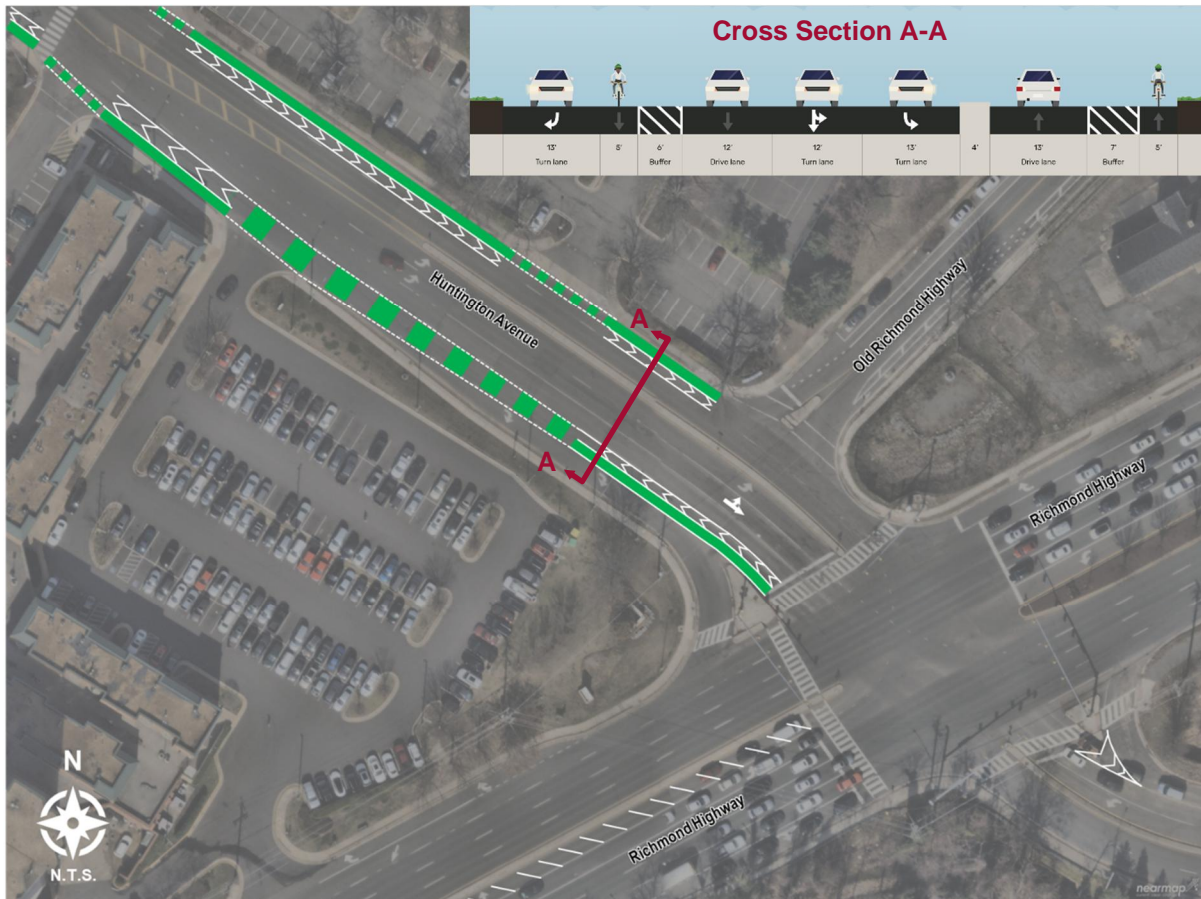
Intersection of Huntington Avenue and Richmond Highway Build Conditions Cross Section and Plan View
